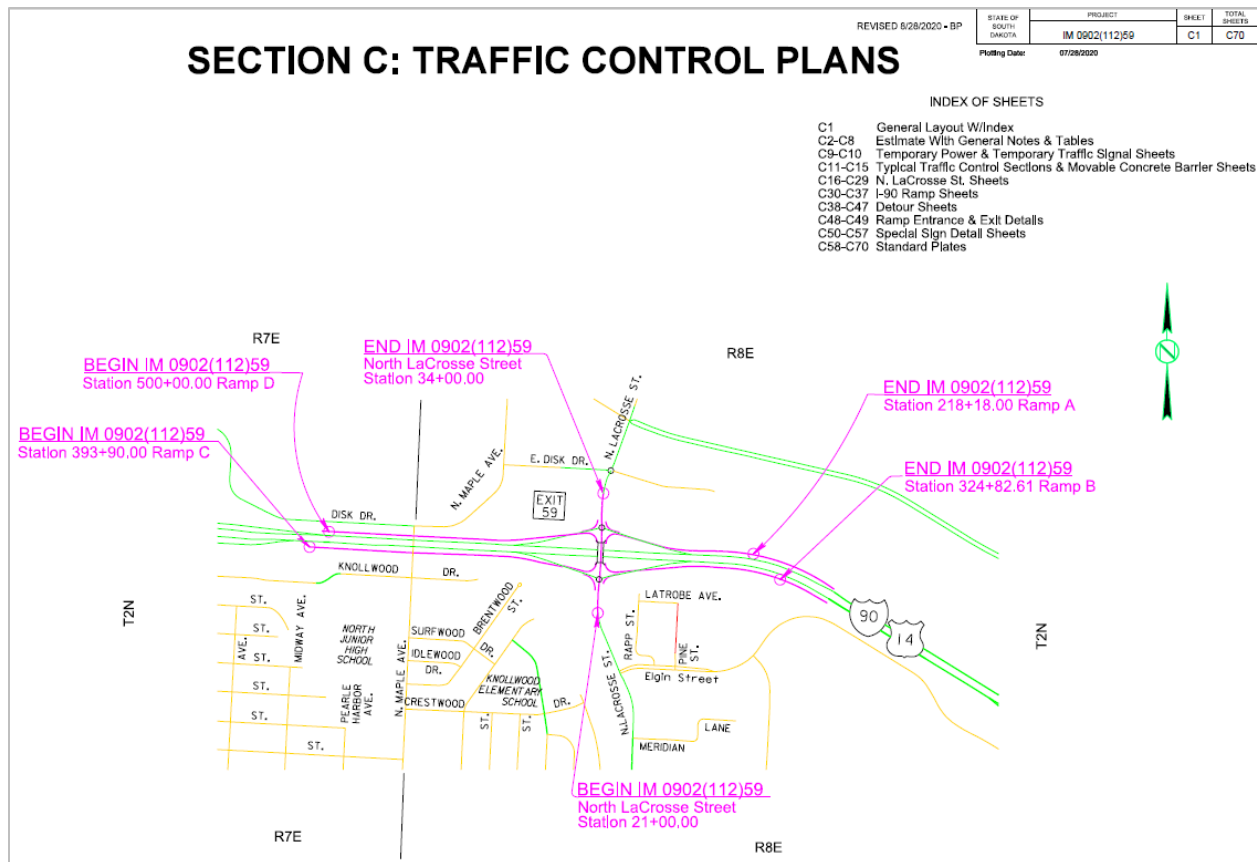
I-90 IM 0902(112)59 Pennington County project plan
